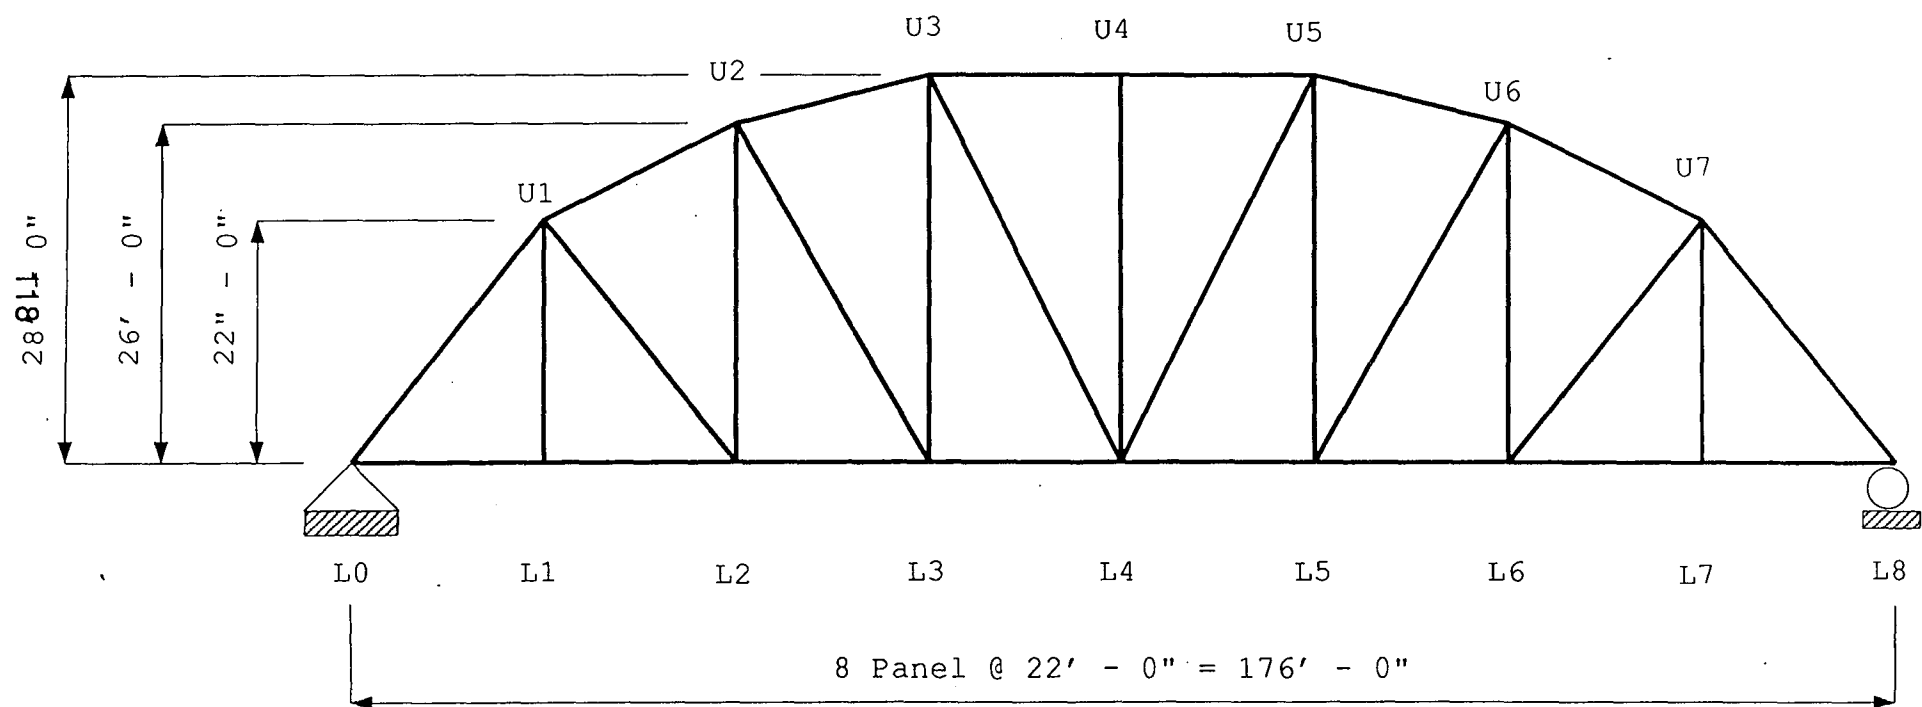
Elevation of Center Trusses (Span 9 Shown)
